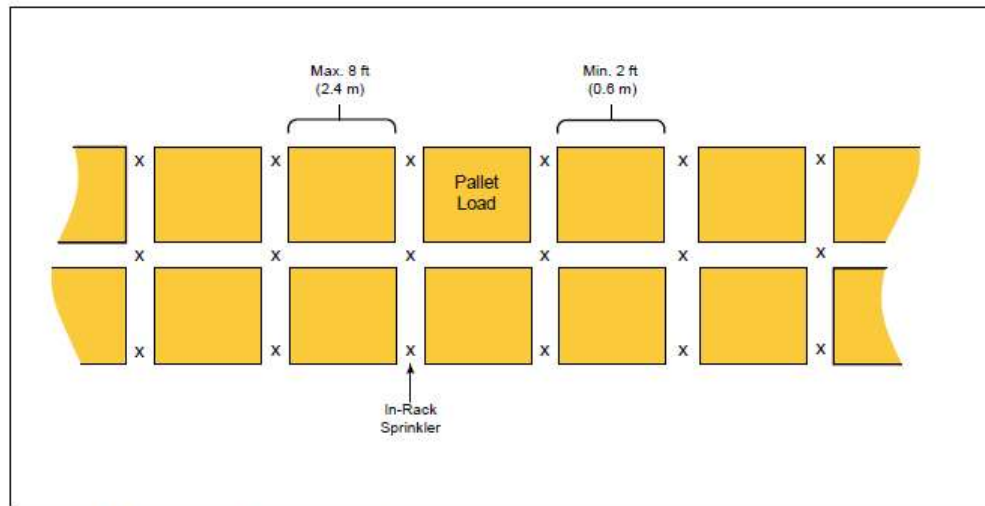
Plan view of IRAS(E) horizontal in-rack sprinkler arrangement for double-row racks (face and flue)
